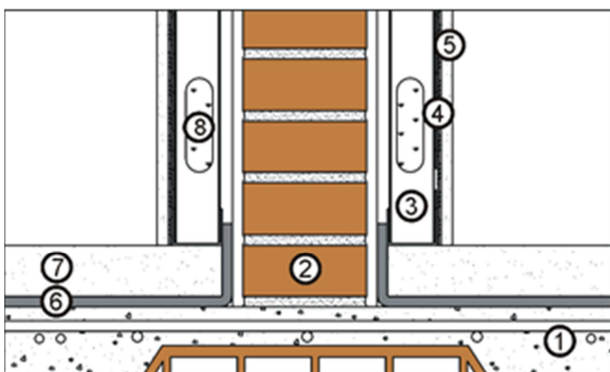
Masonry partition wall or laminated gypsum partition on floating mortar.
